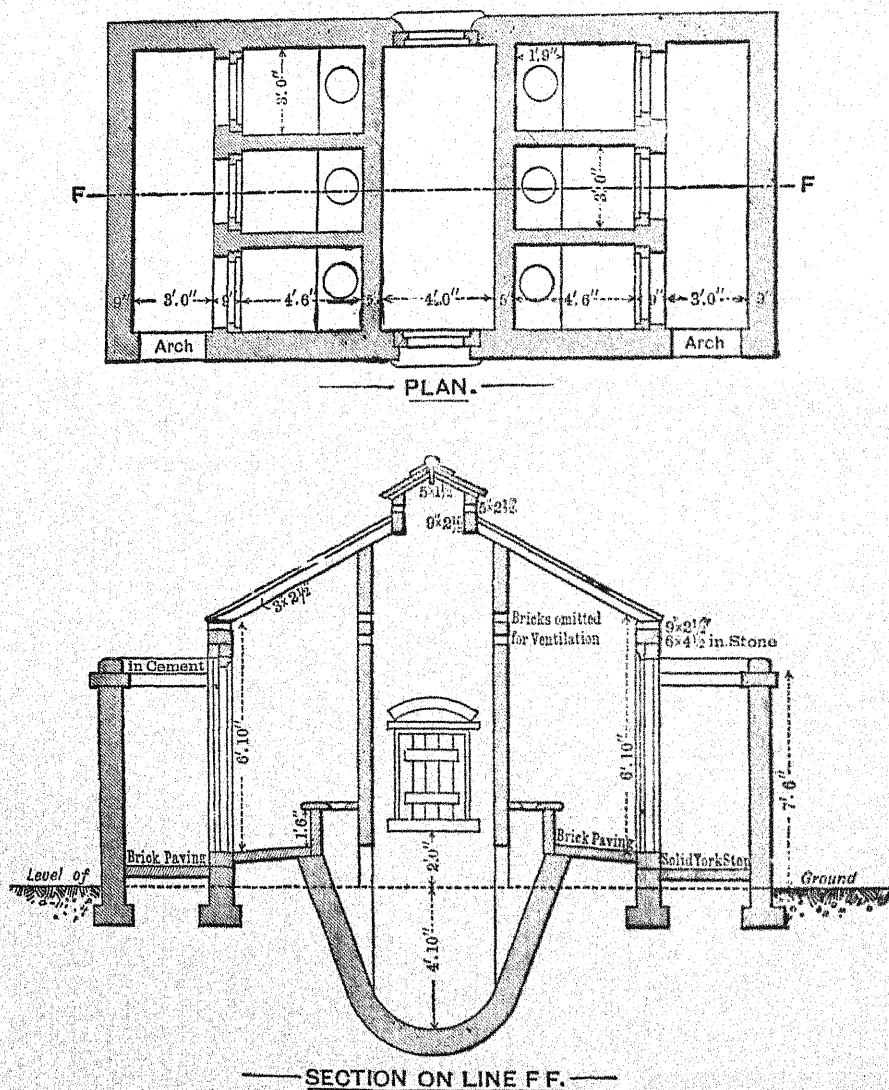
Plan and Section of Midden-closet in use at Nottingham.
